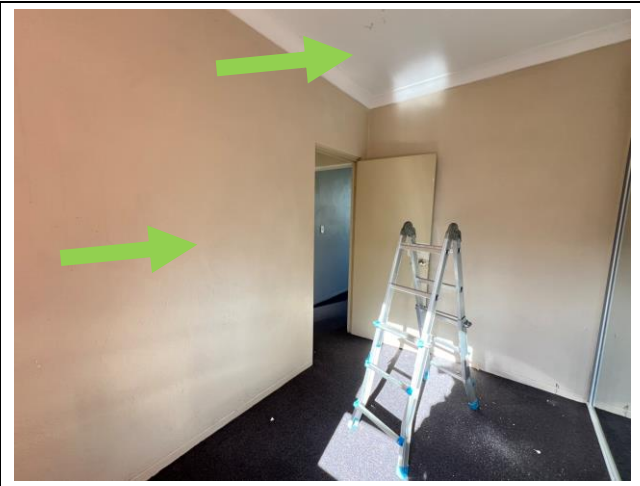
(20.06.24): Representative photo of yellow paint system, internal room 1 walls on all 4 walls, Sample ID: same as 4- LP 8 (< 0.01 % w/w).
